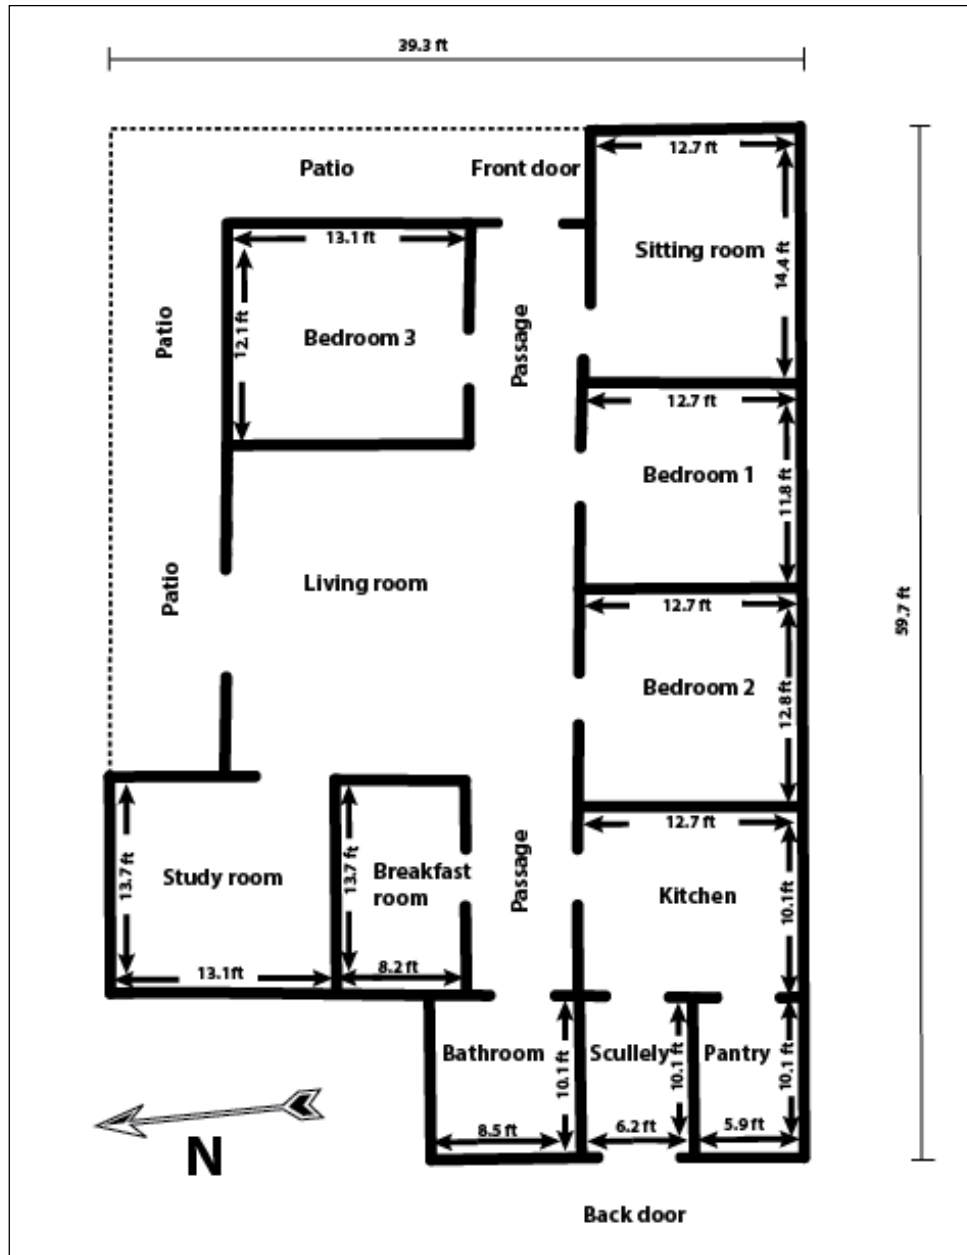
A reconstructed floor plan of a 20th century farmhouse at Blaauwbergsvally inhabited by the Van der Spuy family from 1960-1965 (Breytenbach).
